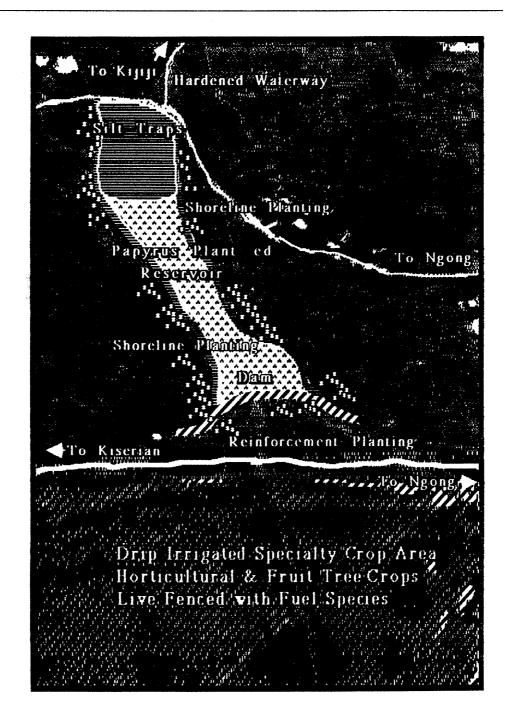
Conceptual Plan of Proposed Kijiji Reservoir
